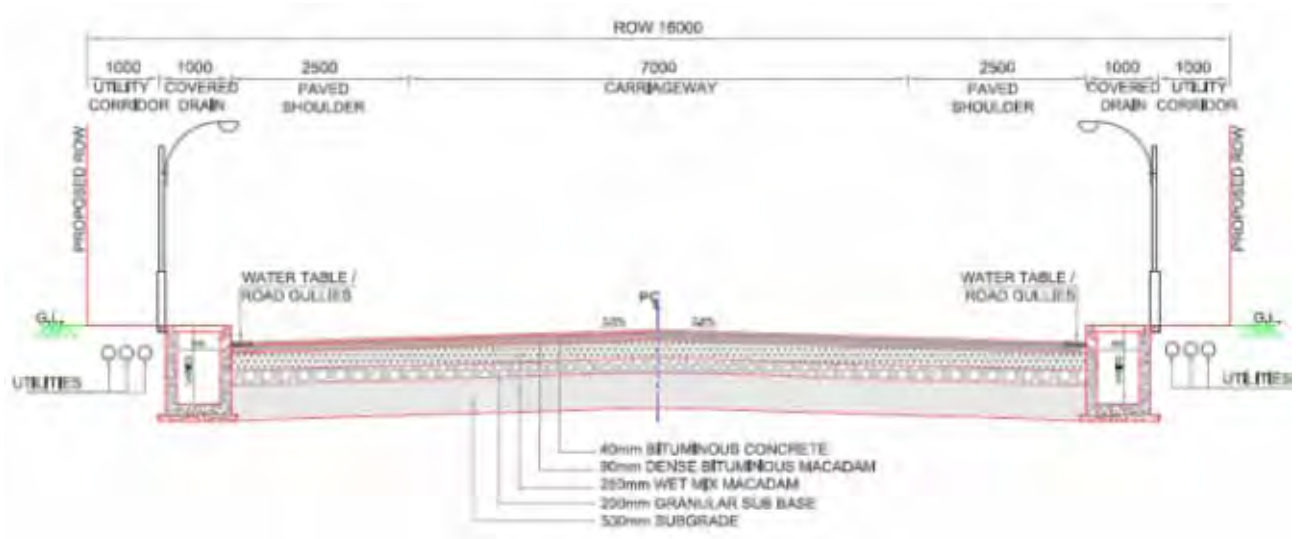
C2-V-N: Two lane carriageway with Paved Shoulder in Village Area (New Construction)
